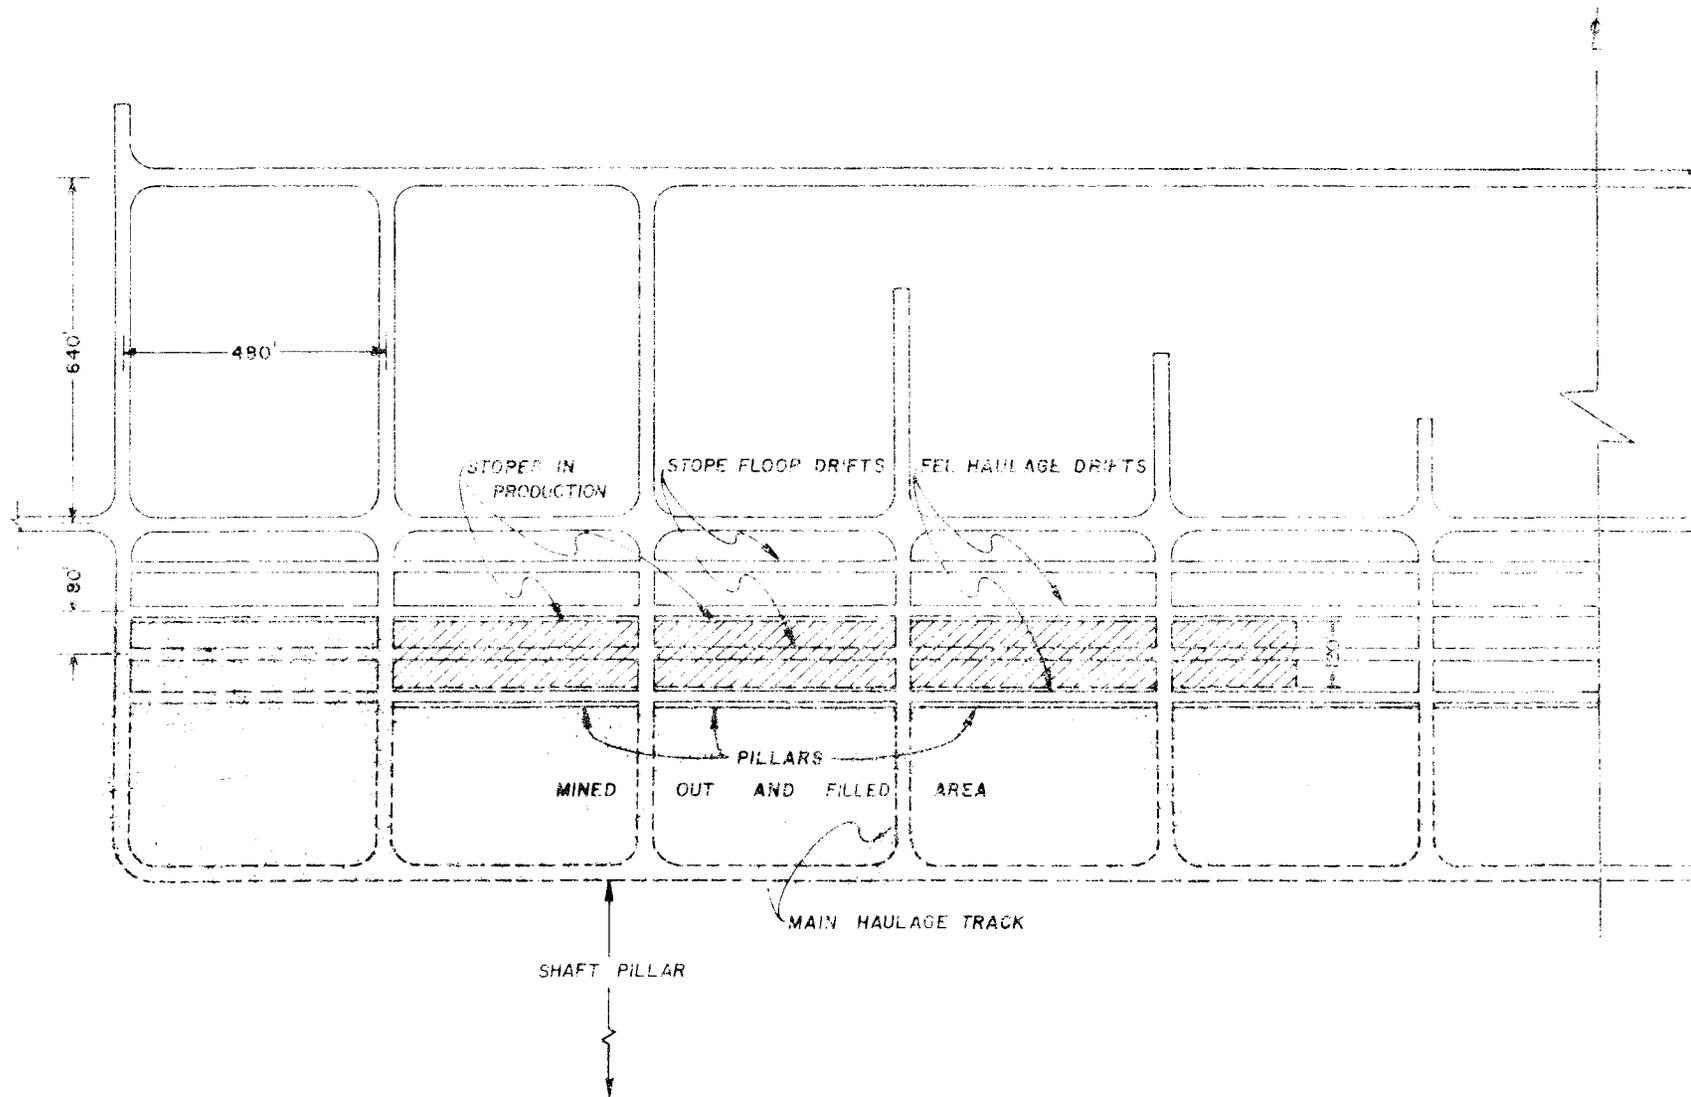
Rail Haulage Layout, Sublevel Stoping with Spent Shale Backfill
